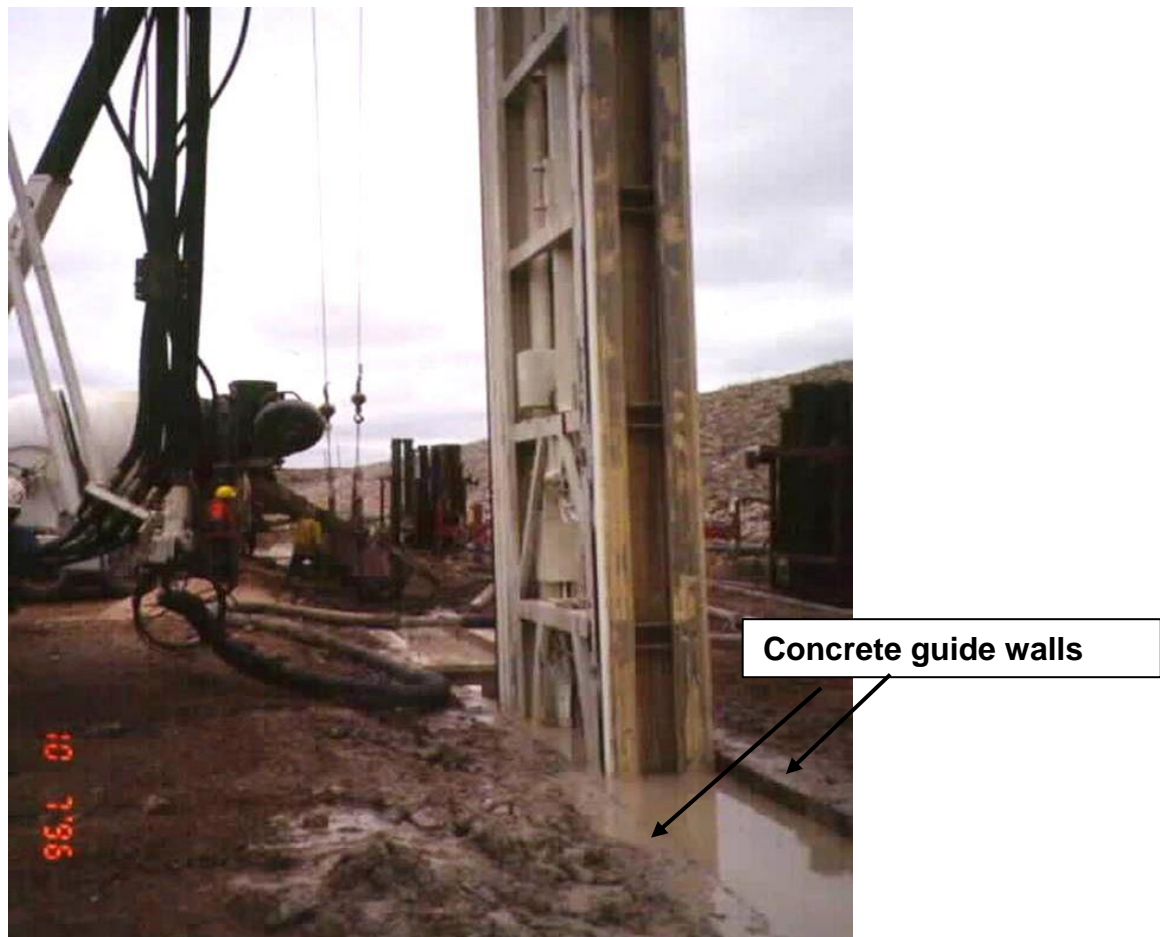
Typical guidewall used to construct a concrete cutoff wall (Meeks Cabin Dam, Utah).
